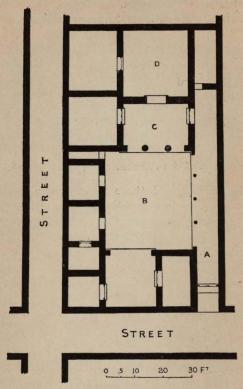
PLAN OF A GREEK HOUSE AT PRIENE, FACING SOUTH.
